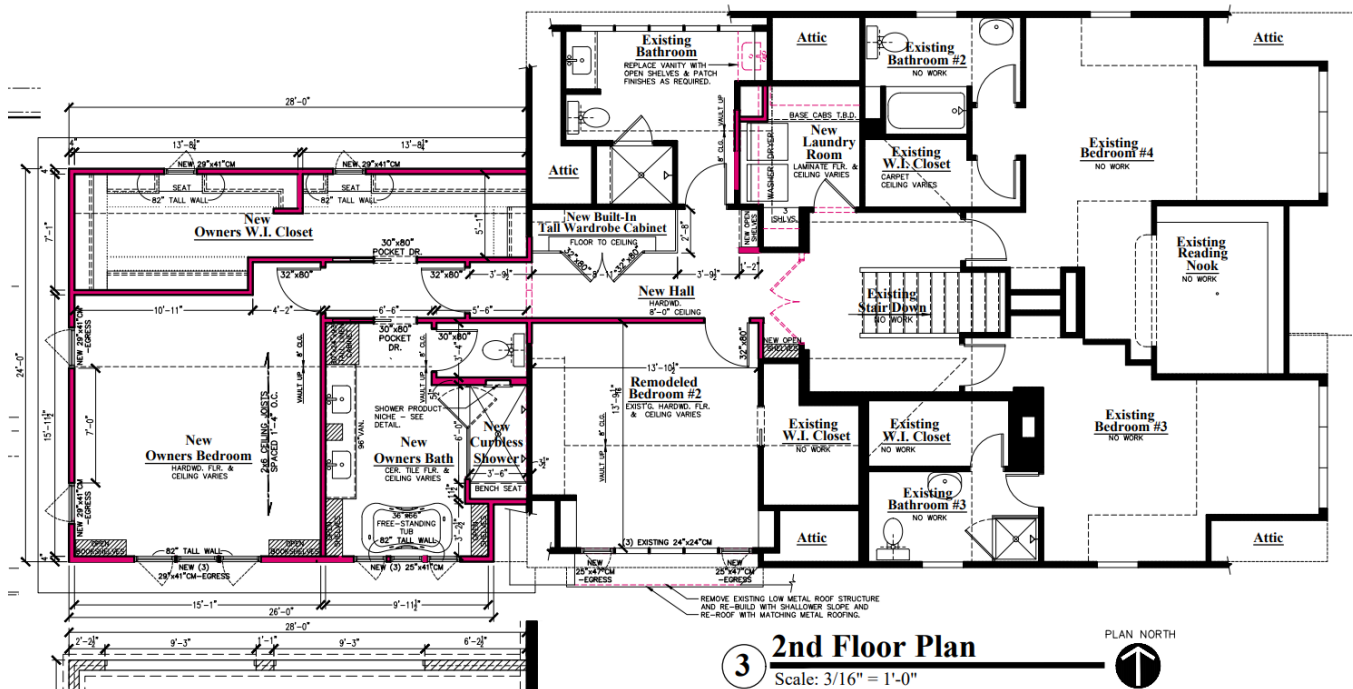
Floor plan of 2<sup>nd</sup> floor.
